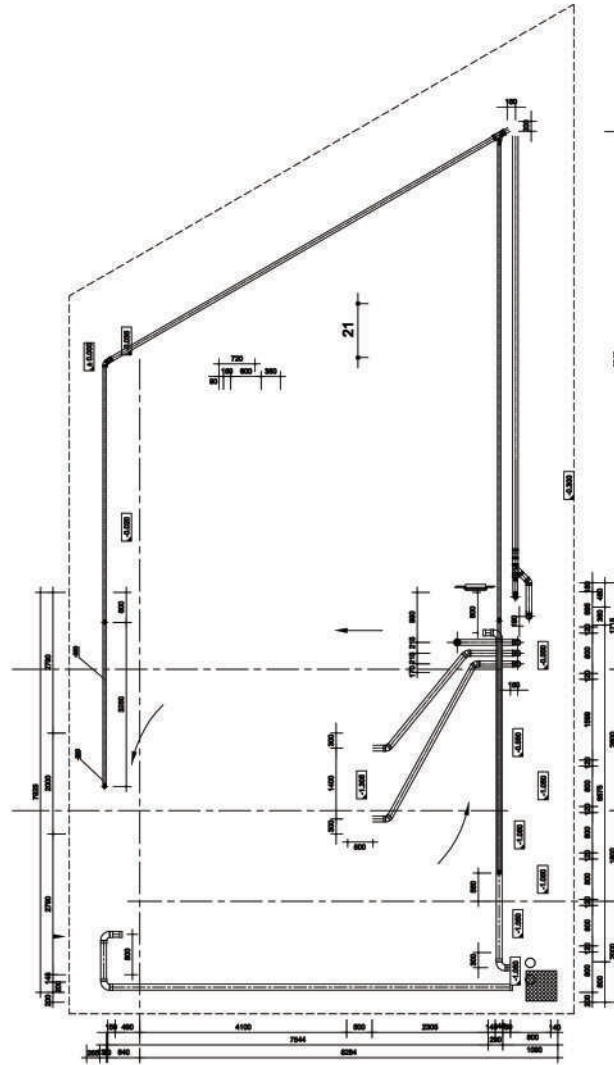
Pipes installation in koi fish pond, scale 1-150
